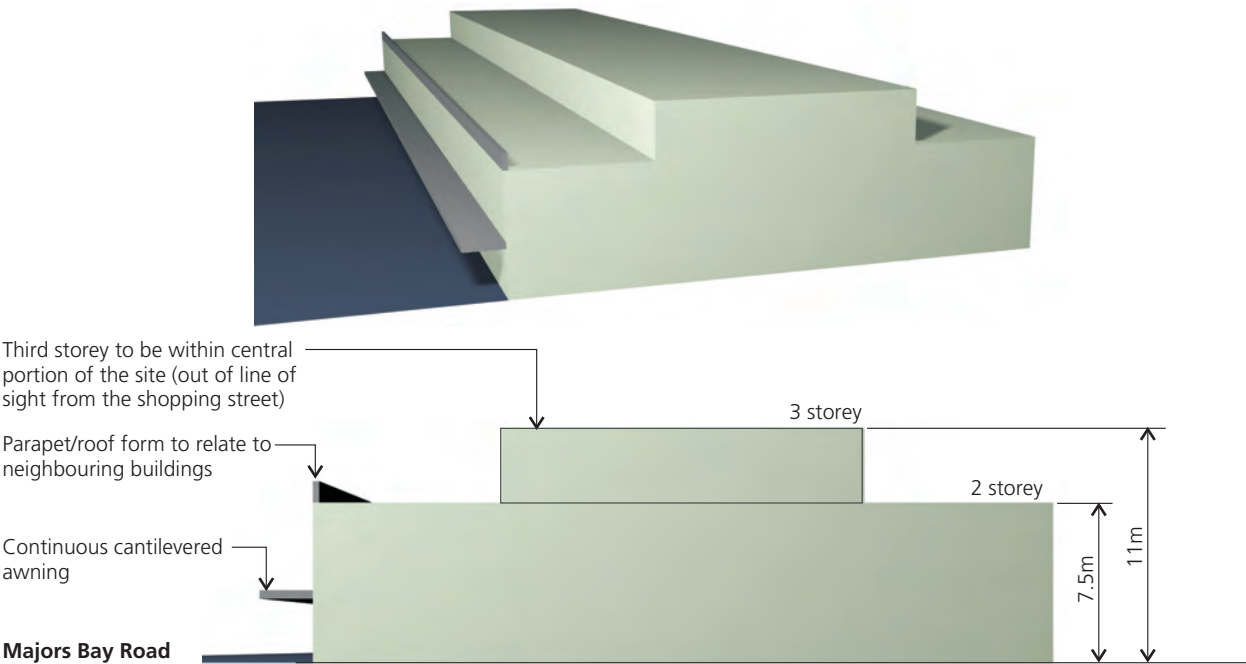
3D envelope for Majors Bay Road - 3 storey building
